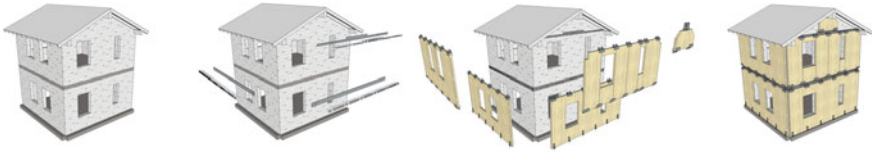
Strengthening concept using CLT plates simply fixed to the existing wall elements [102]
